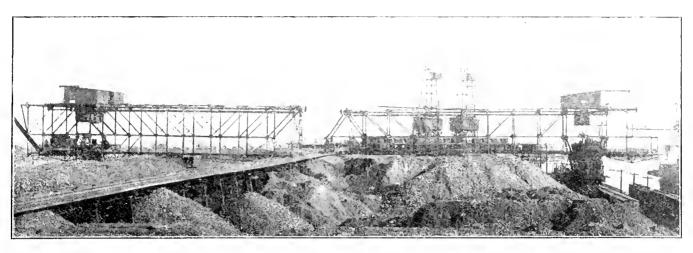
Mead Hoist Towers, Automatic Cars, Cable Railway and Bridges, Milwaukee Western Fuel Company's Washington Street Dock, Milwaukee
